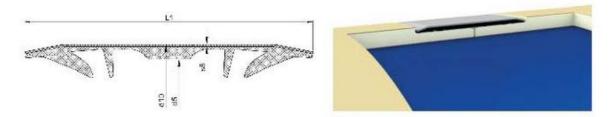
Pressure Jacking Coupling (PJC) cross section and assembly
